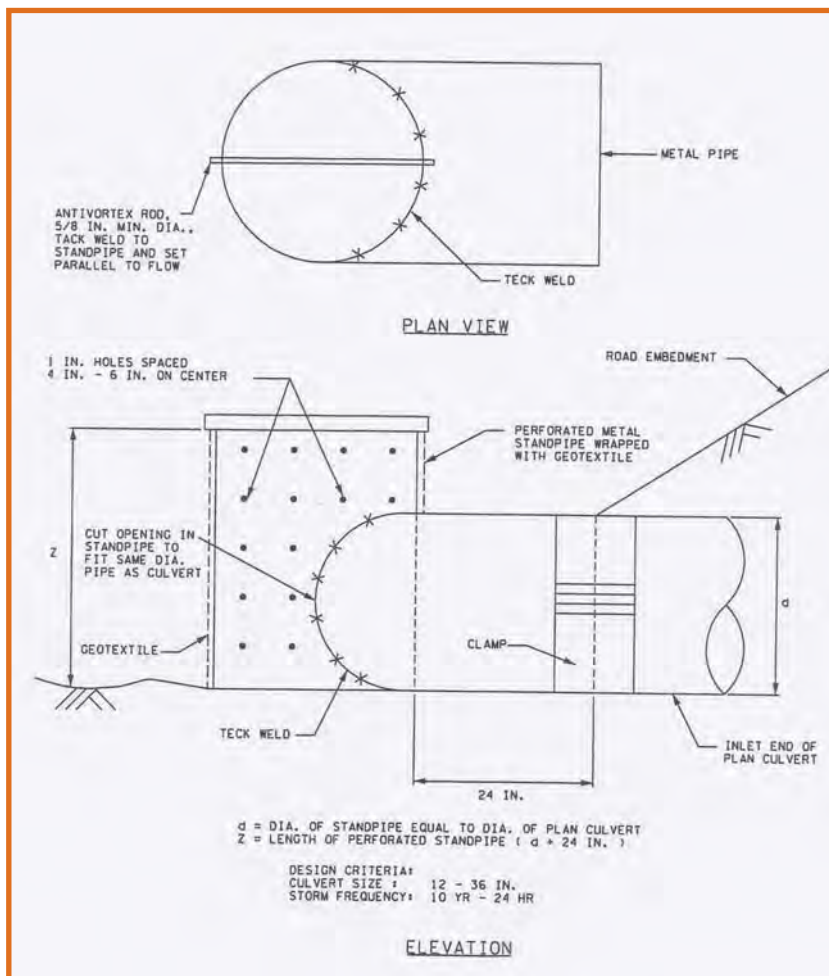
Temporary Standpipe for Sediment Control on Culvert Inlet.
